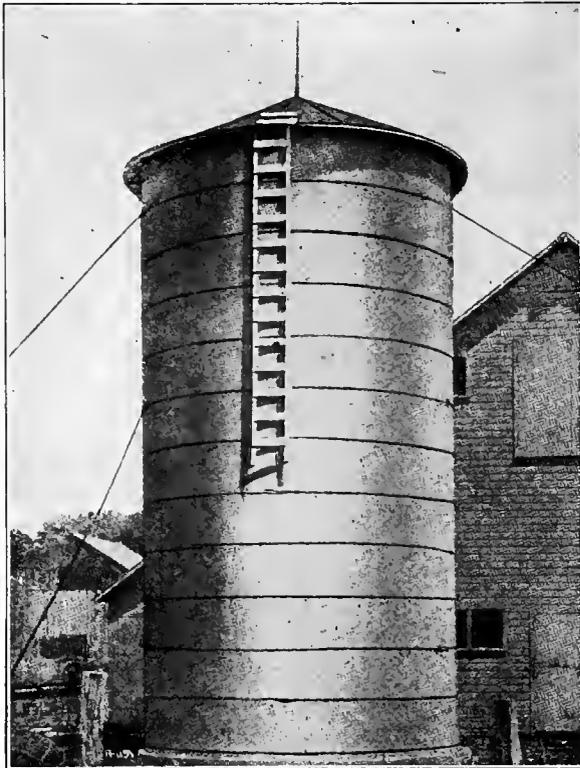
A Wooden Stave Silo Properly Constructed and Braced.
